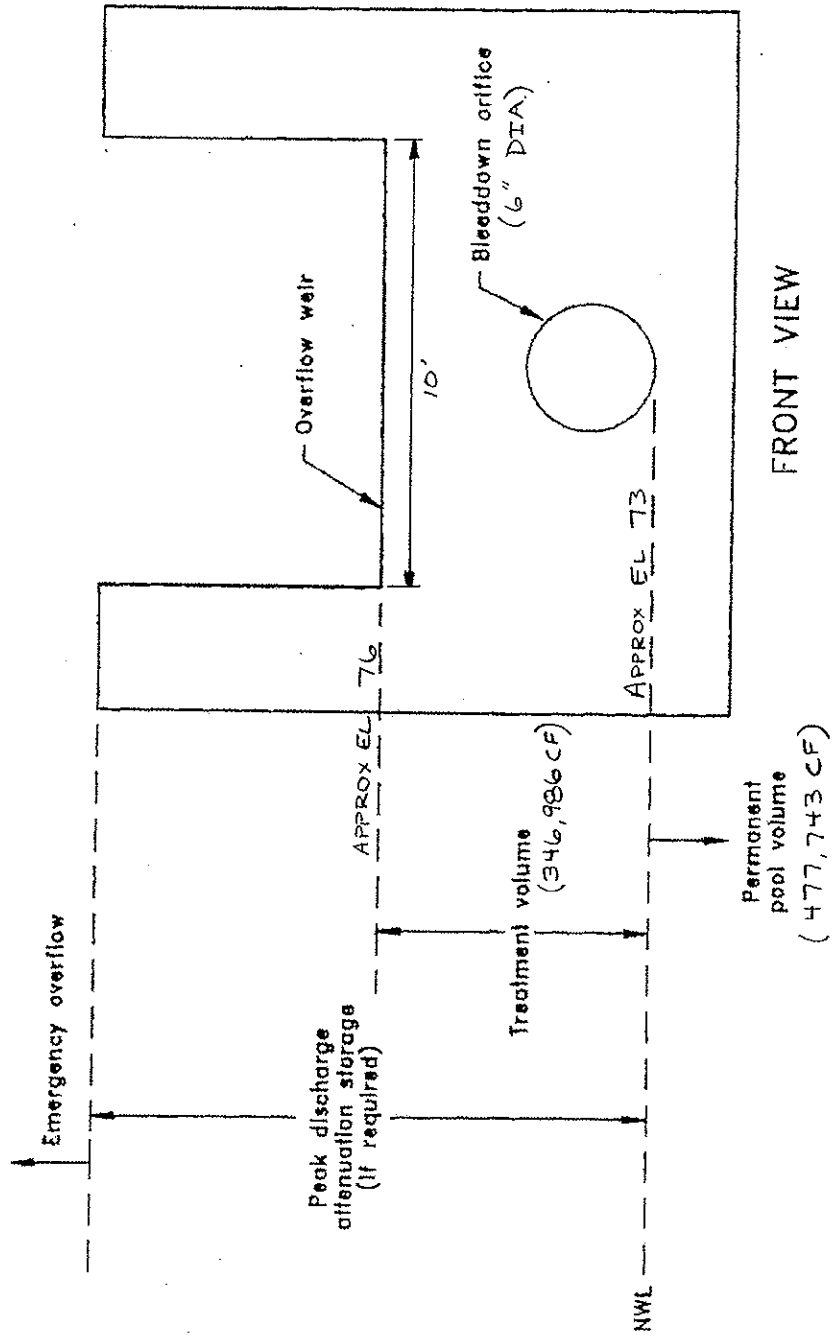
Typical wet detention outfall structure (N.T.S.)
